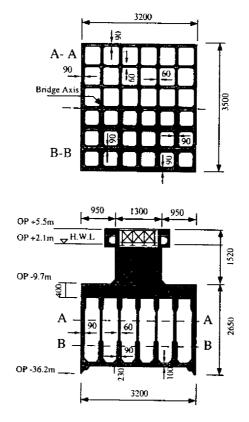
Horizontal and vertical cross-sections of the foundation at P24 (dimensions in cm)
